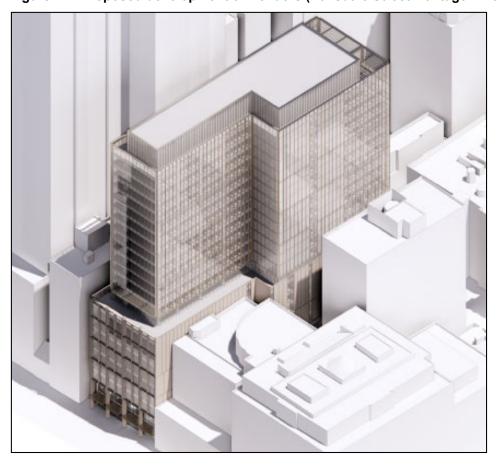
Artist impression of the proposed Lonsdale Street frontage
